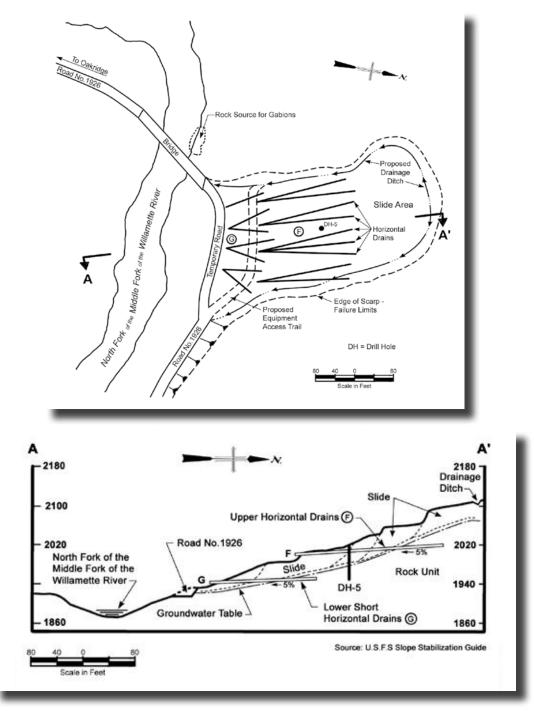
Plan view and cross section of horizontal drains used on a slope stabilization project.
